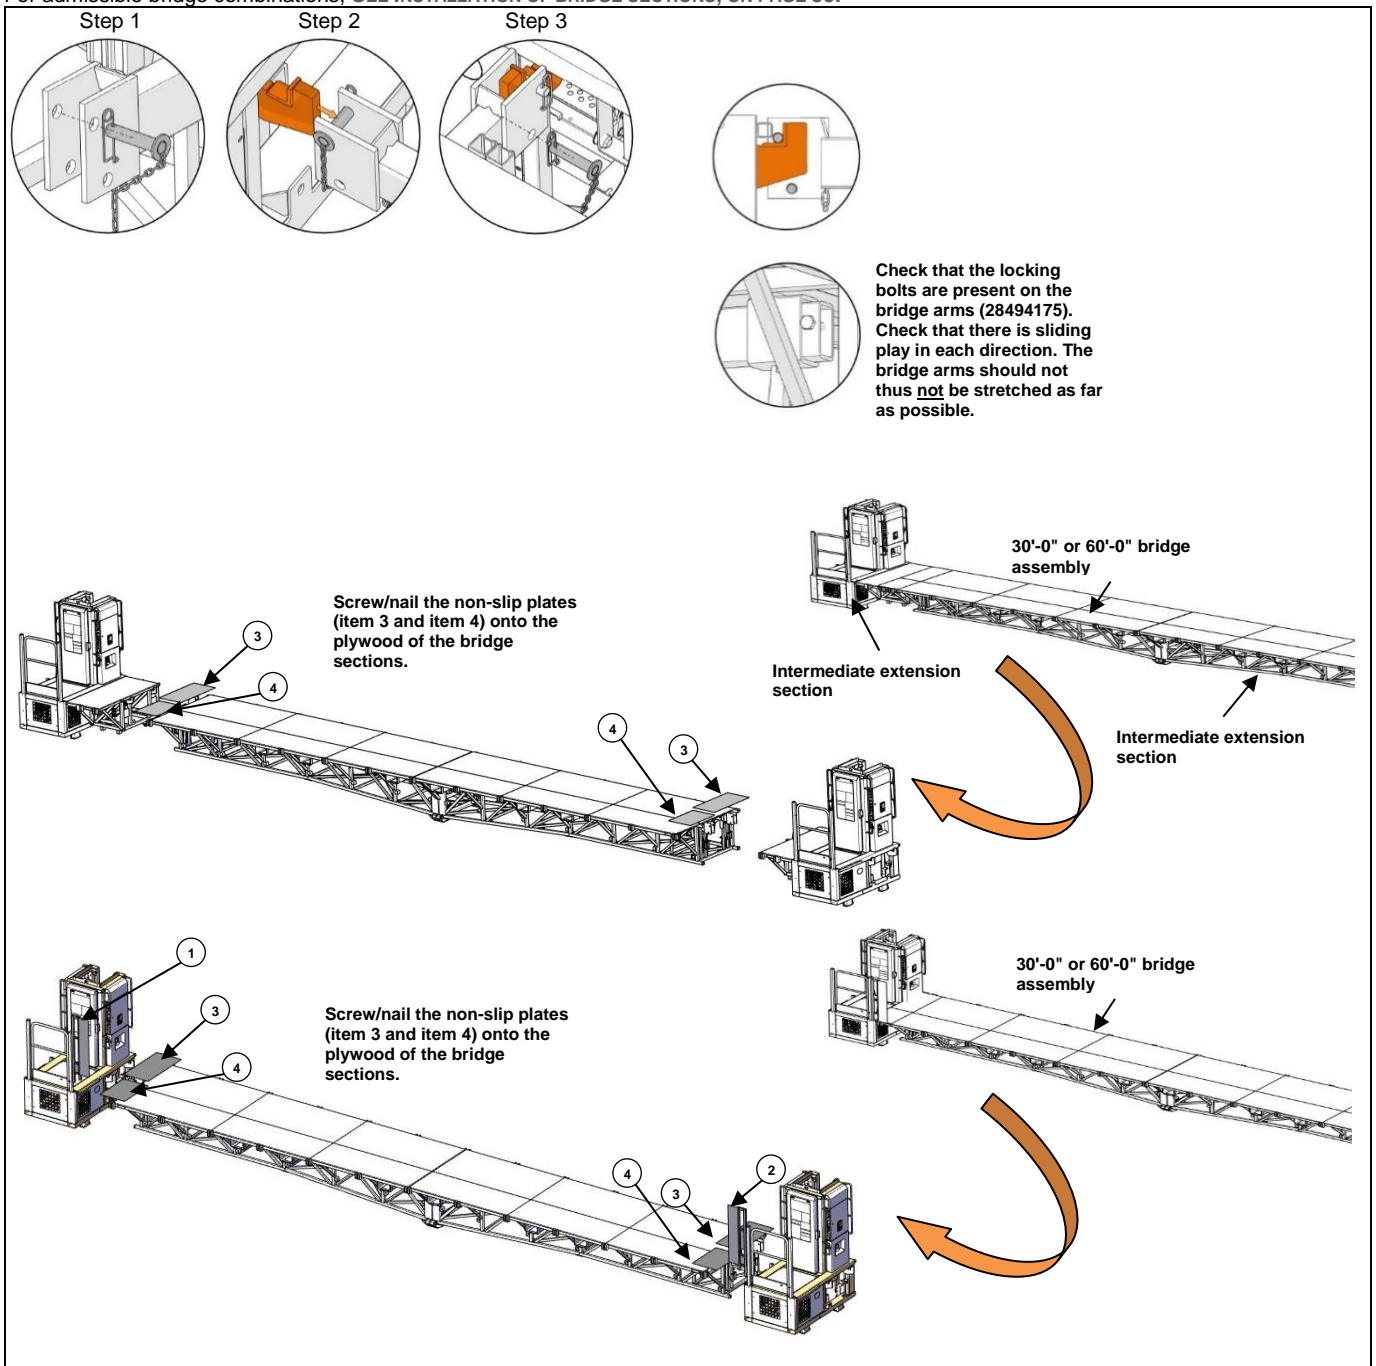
Installation of 15'-0" or 20'-0" bridge section between lifting units and/or intermediate extensions
